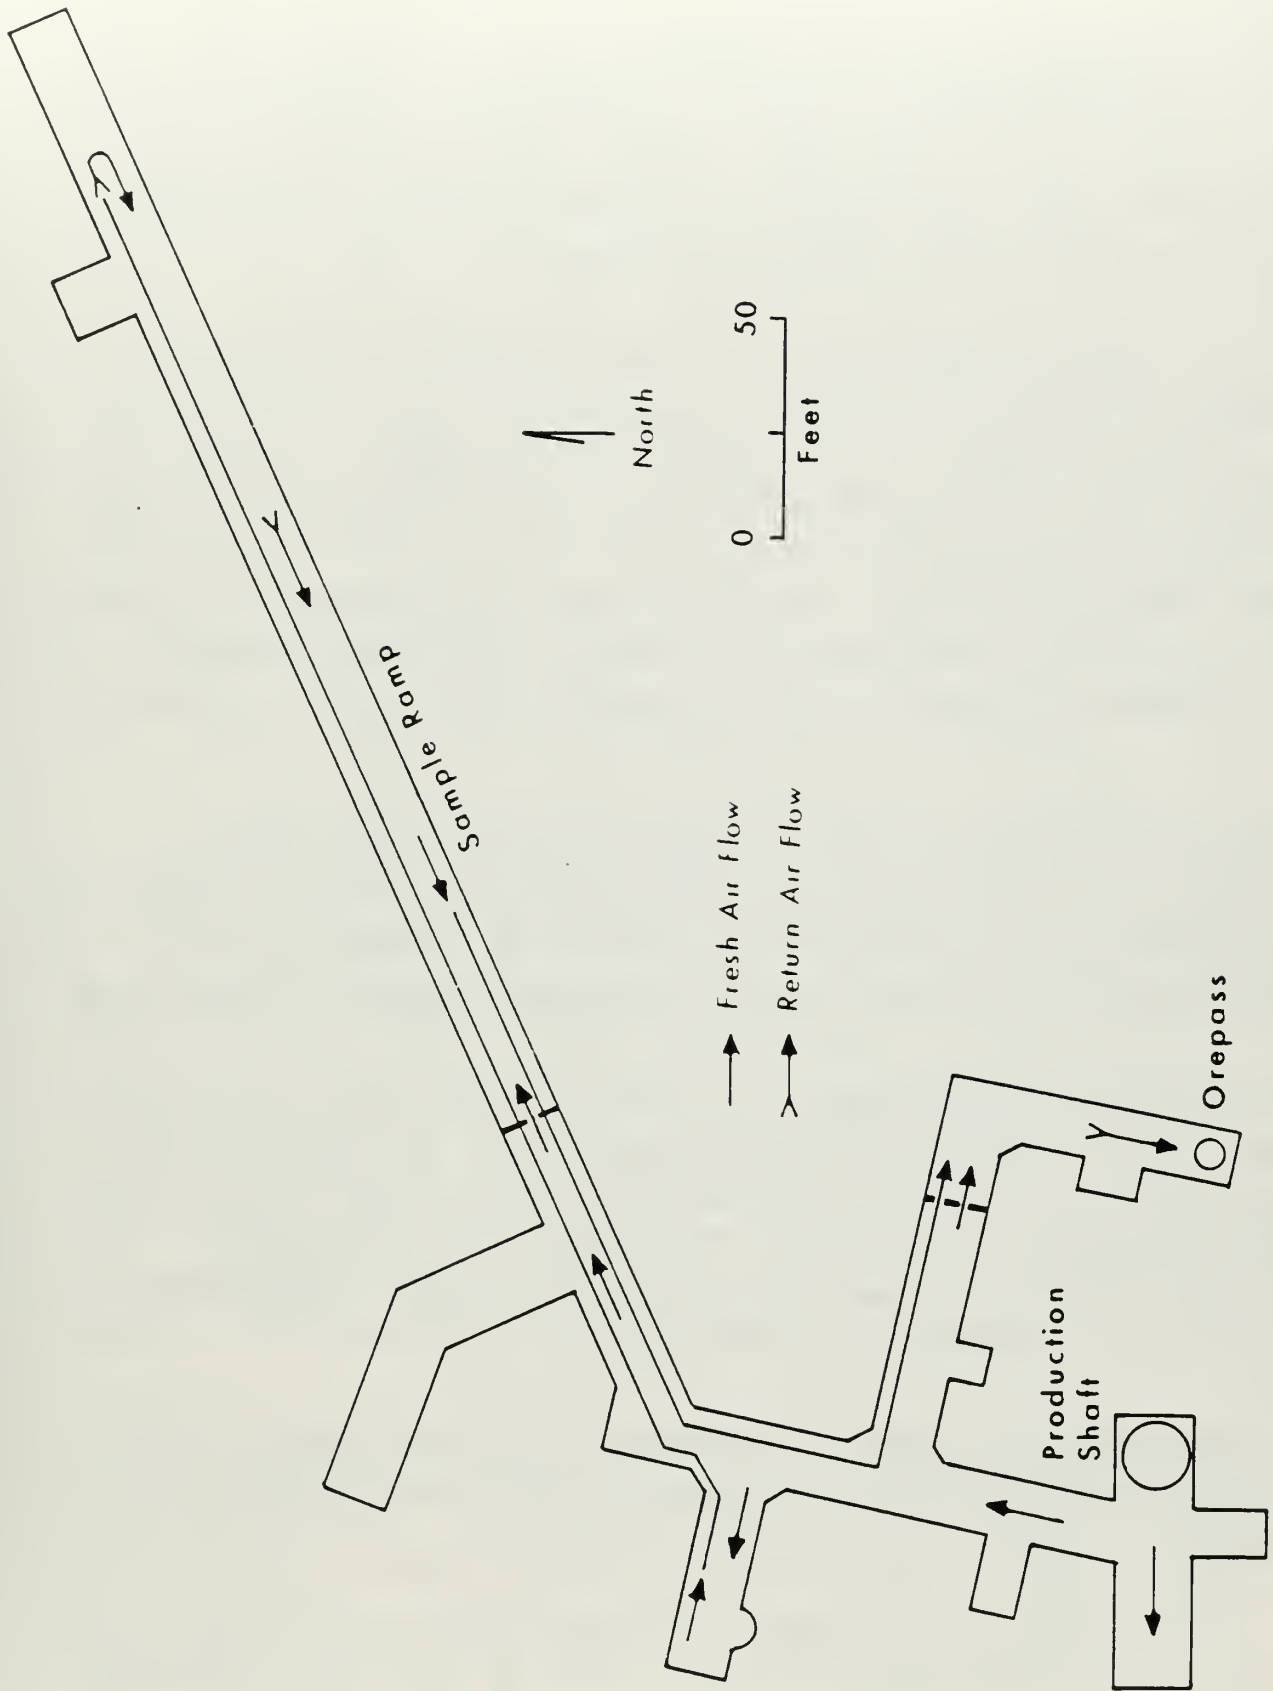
'C' Level Design and Ventilation Plan (Inactive)
